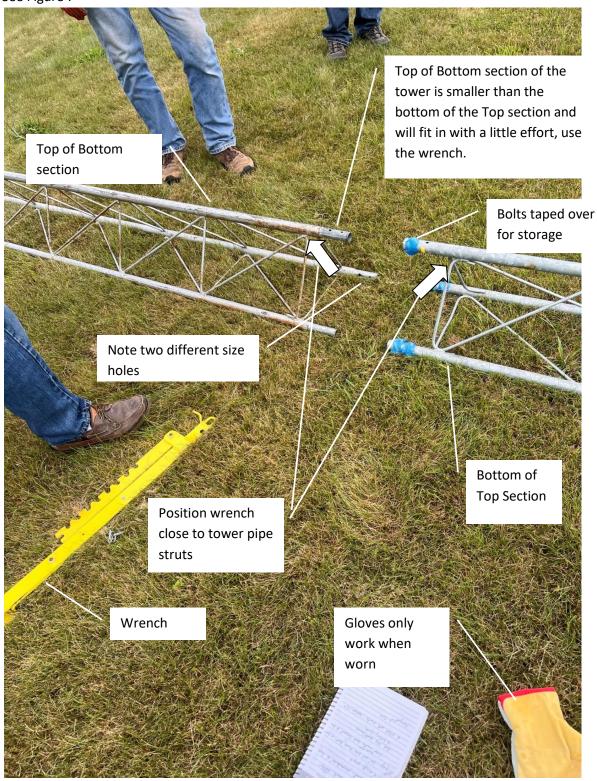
Assembly of Rohn Tower Sections: Giggle bottom and top Rohn tower sections to connect. Use two size bolts to secure. Yellow wrench is used for leverage.
